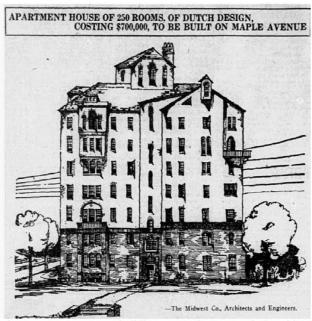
Rendering of seven-story apartment building on Maple Avenue designed by The Midwest Company (*Dallas Morning News*, 28 October 1924:1).
